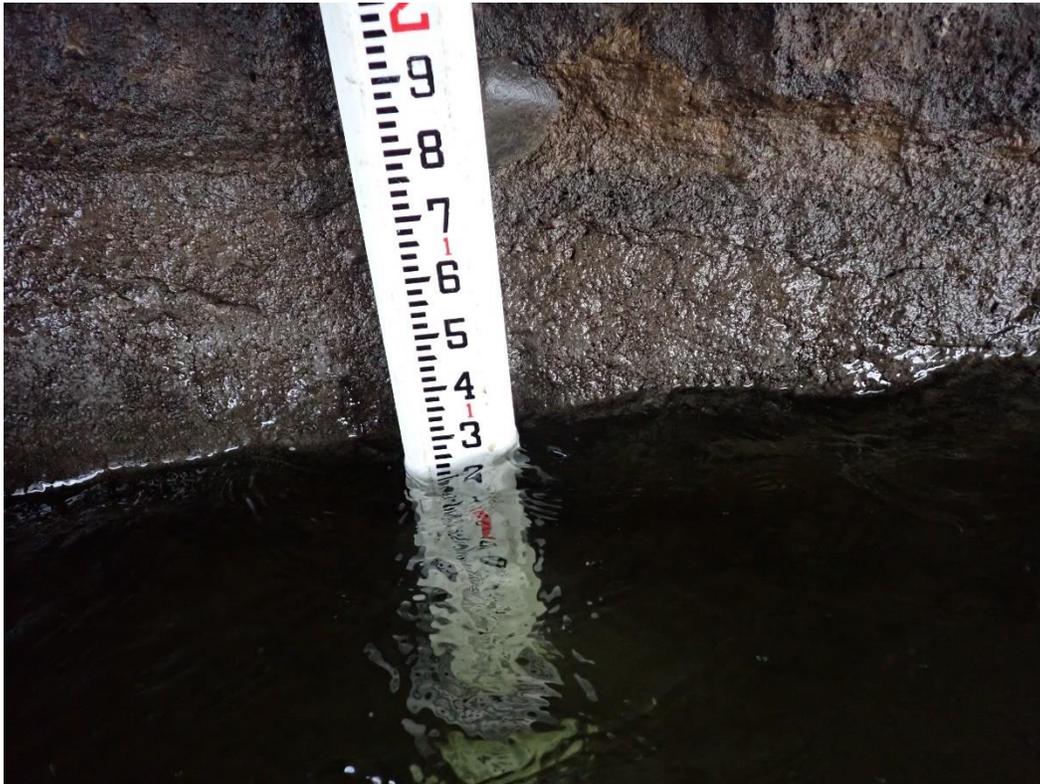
NORTH ABUTMENT TYPICAL CONCRETE CONDITION AT WATERLINE LOOKING NORTH
